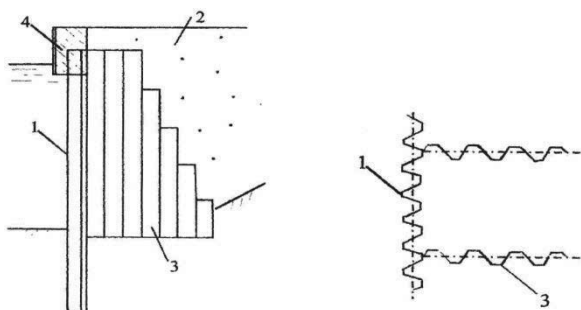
Sheet piling wall with counterforts: a – cross-section; b – plan. 1 – axial sheet piling; 2 – soil backfilling; 3 – sheet piled counterforts; 4 – cap.
